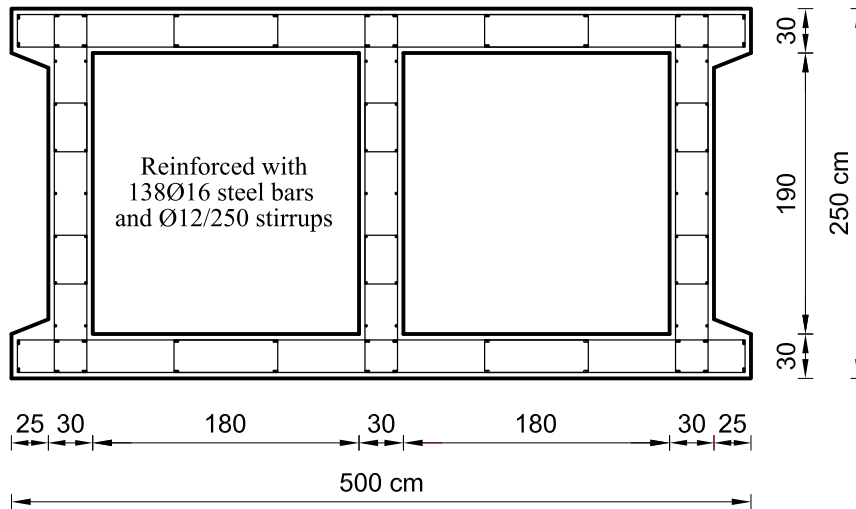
RC bridge pier: cross section and reinforcement layout of a single column bent
